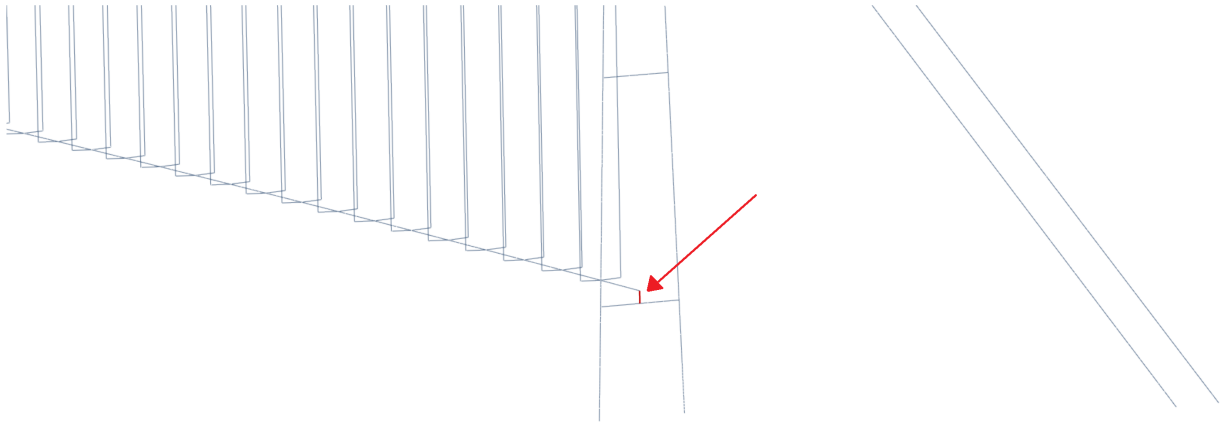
Connecting element between the stiffening girder and the transverse beam
